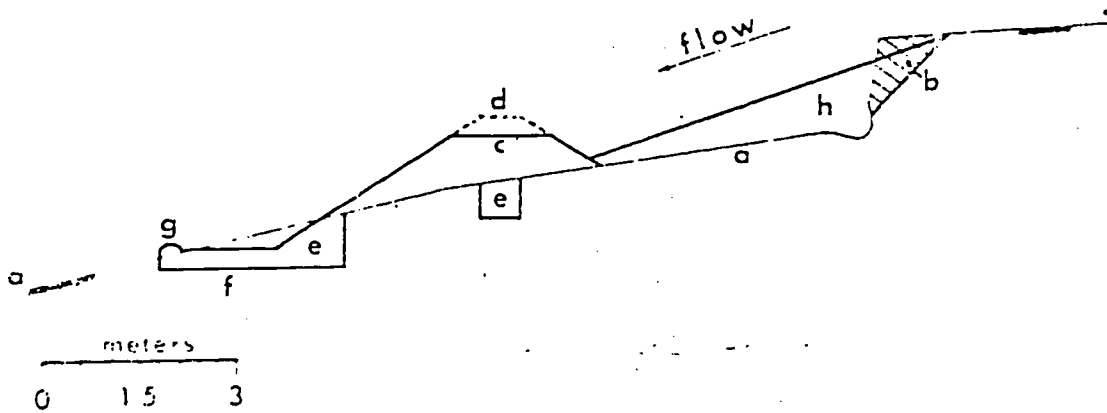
Construction plan for a gully headcut control with a loose-rock check dam. The section of the structure is parallel to the centerline of the gully. a = original gully bottom; b = excavated area of headcut wall; c = spillway; d = crest of freeboard; e = excavation for key; f = excavation for apron; g = end sill; h = rock fill.
